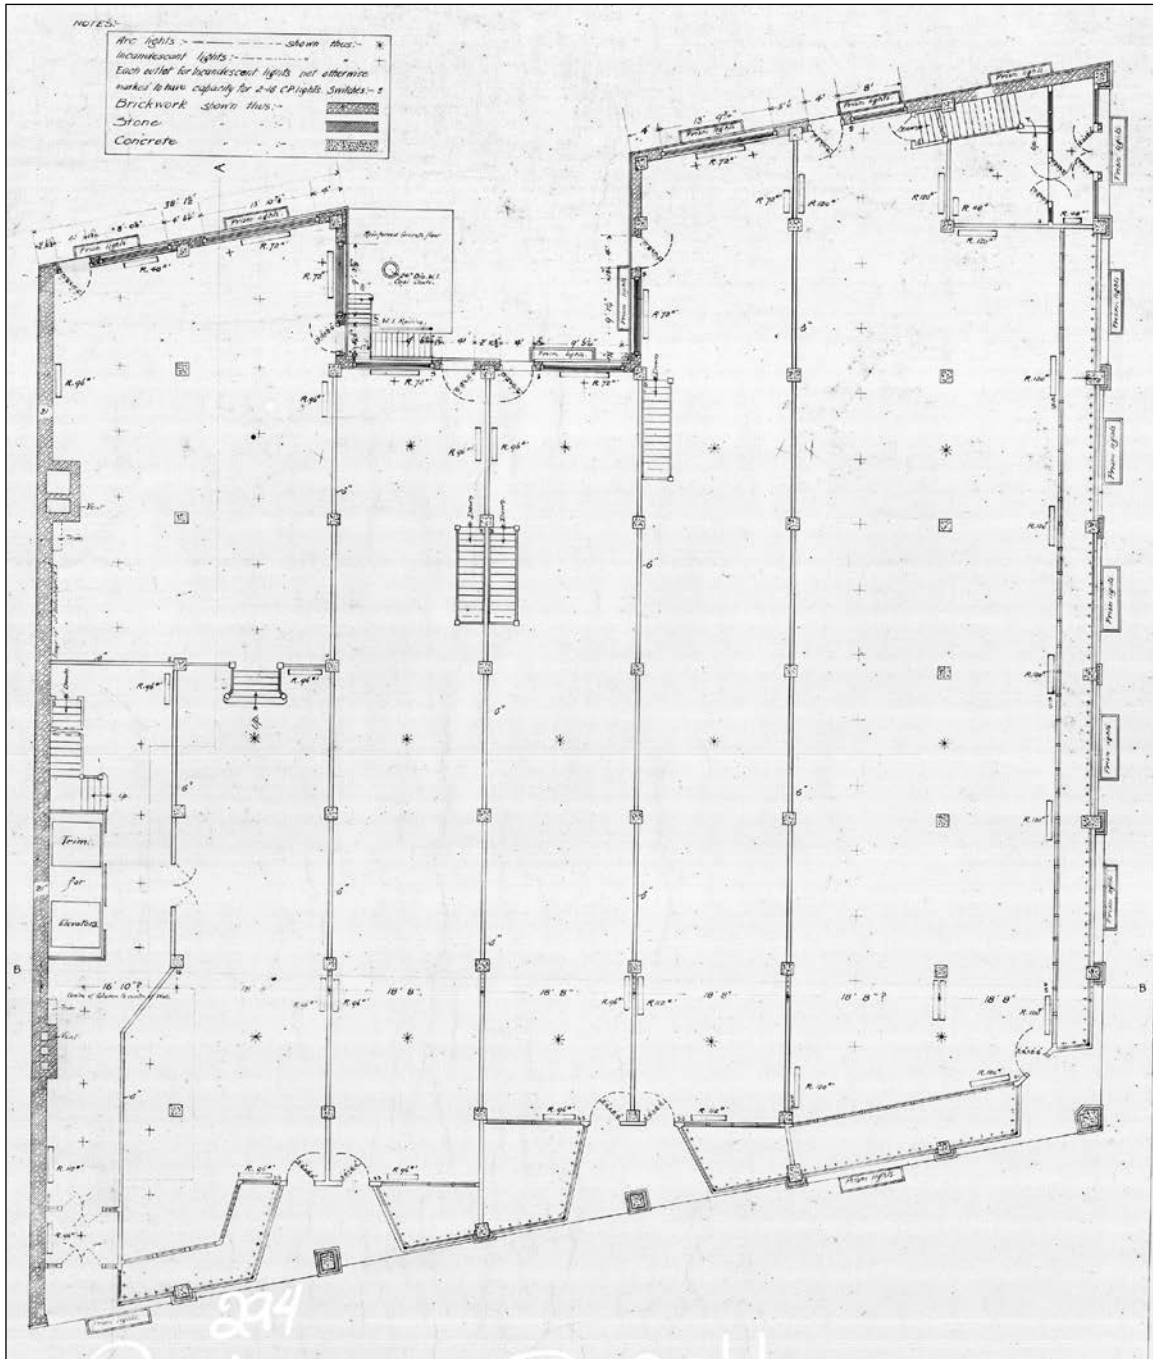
Somerset Building, Portage Avenue, Architect’s Plans, “Ground Floor Plan,” 1906.
